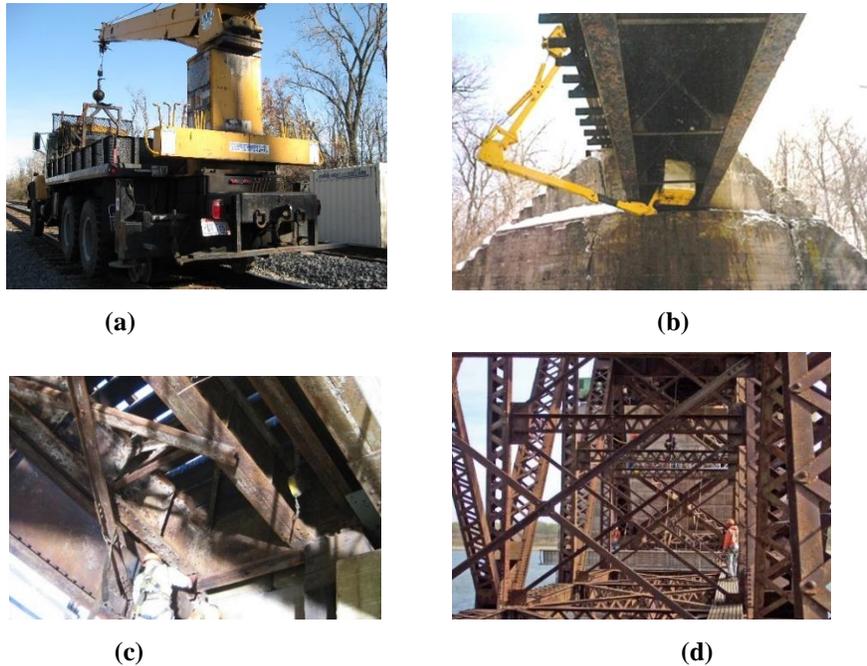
(a) Cherry picker on track level; (b) Cherry picker during bridge inspection; (c) Bridge inspector inspecting bottom flange; (d) Rating and inspection of a large span steel railroad bridge.
